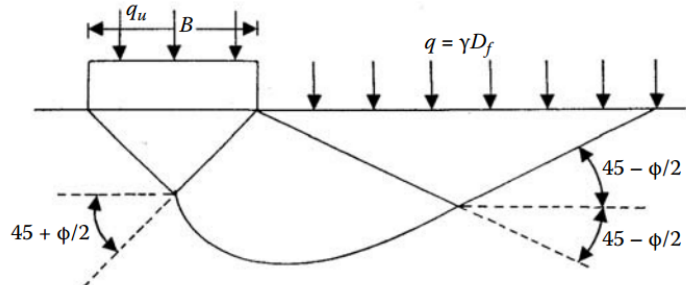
Modified failure surface in soil supporting a shallow foundation at ultimate load.
